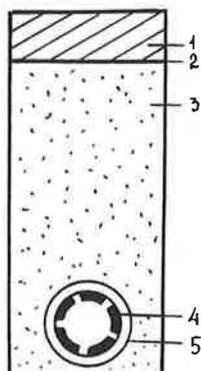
Under-trench drainage structure with a synthetic pipe in the geotextile envelope: 1-compactd clay soil; 2-geotextile interlayer; 3-medium-sized sand; 4-synthetic drainage pipe; 5-geotextile envelope
